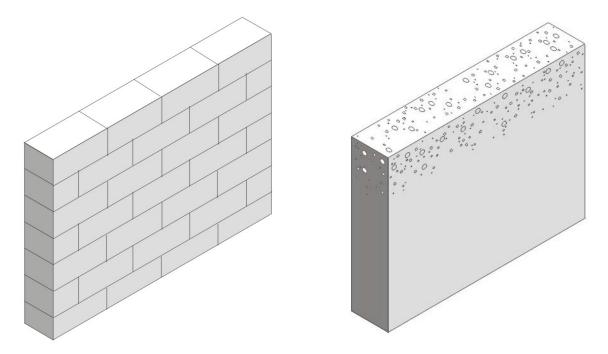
Solid Unit Masonry (left) and Solid Concrete (right) Walls
